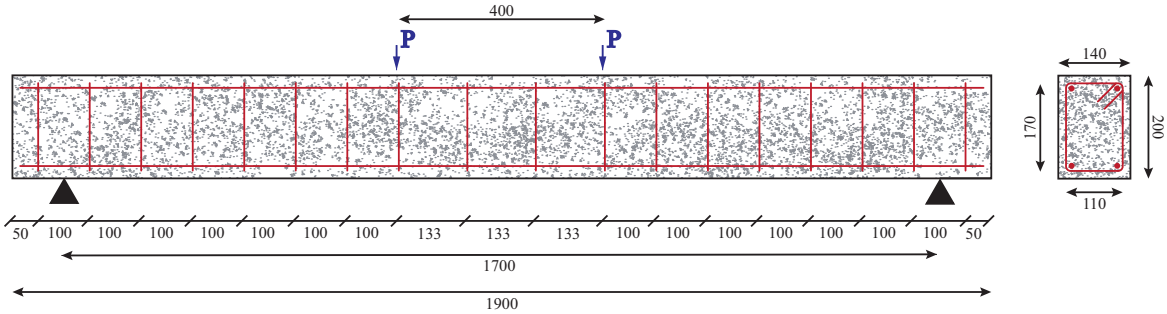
Long beam reinforcement blueprint, not a scale.
